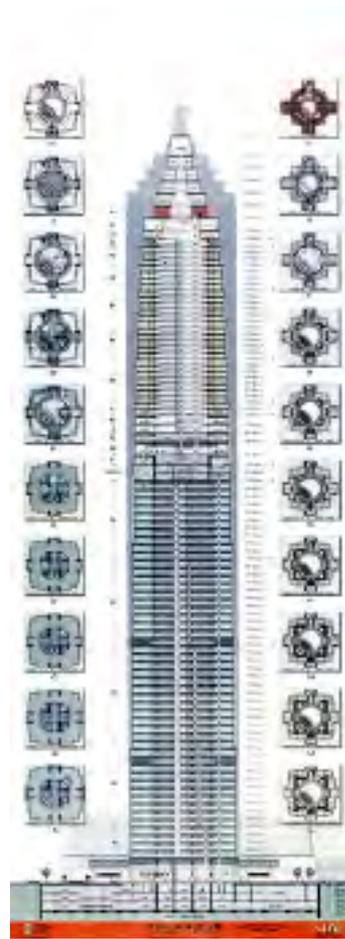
Jin Mao Tower Cross Section showing open lobby section in the top part of the building
